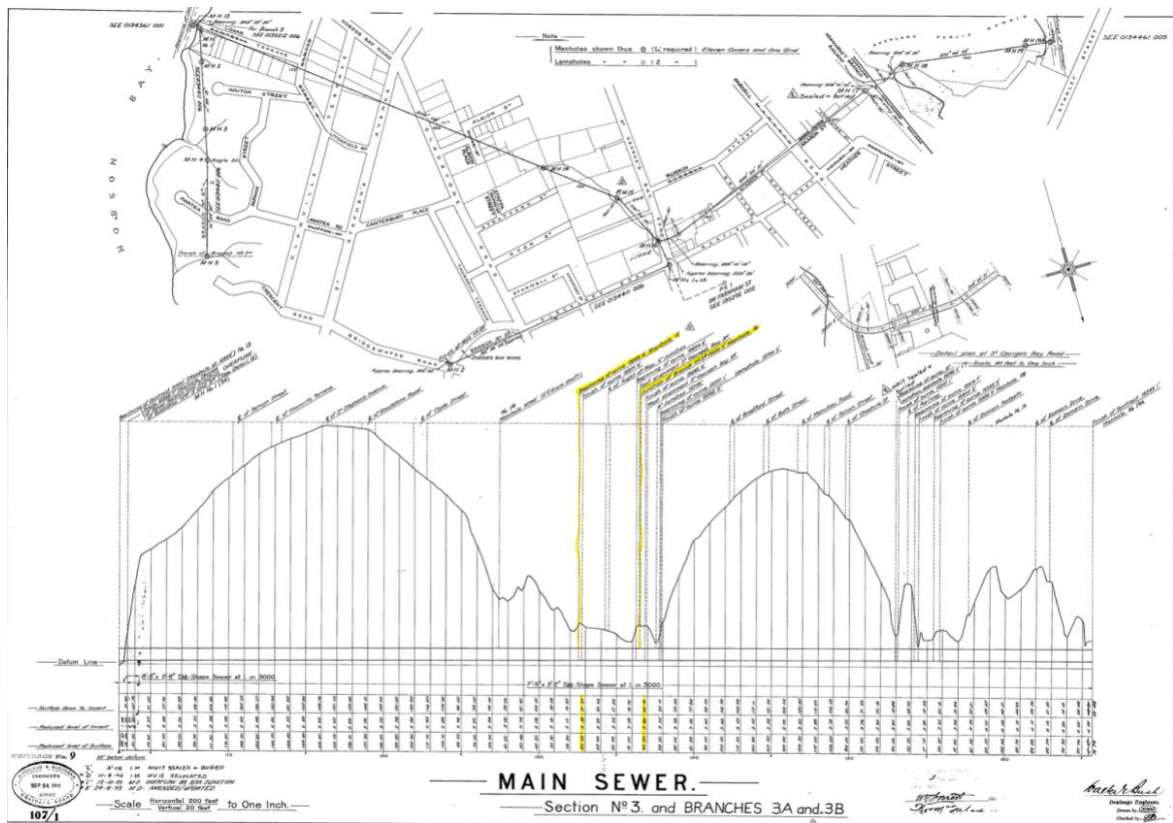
Longitudinal section of the sewer main, with failure section between the yellow highlights
